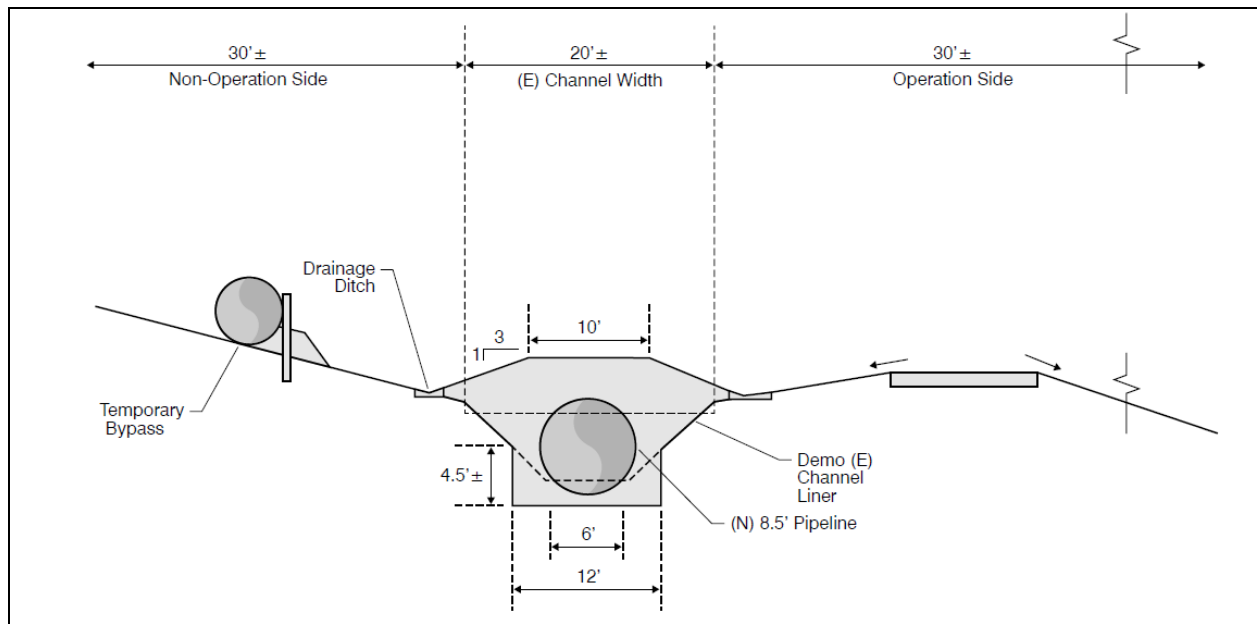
Pipeline Installed in the Canal where the Canal is Constructed on a Slope
